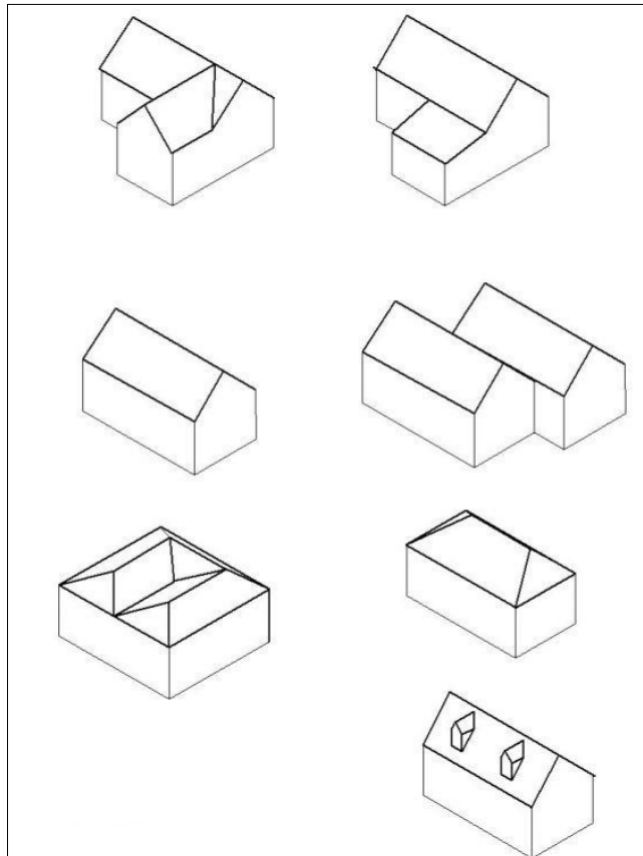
Roof forms as required by clause NOR-S6.7.2 A1
